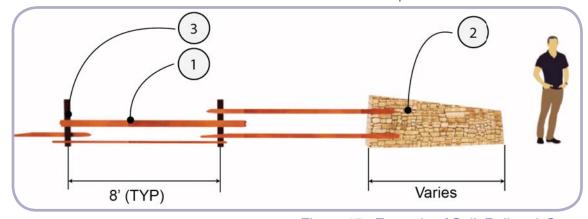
Example of Split Rail and Stone Veneer Accent Element
